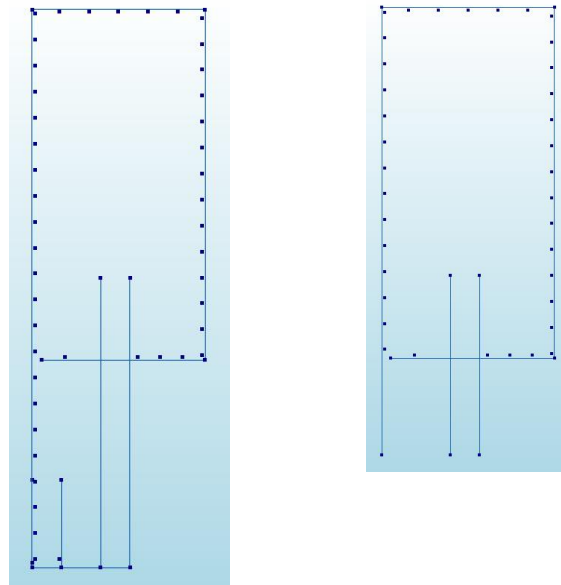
Sections of reinforcement arrangements. Conventionally reinforced according to the case study (left) and the proposed design with a fiber reinforced capping beam extension (right).
